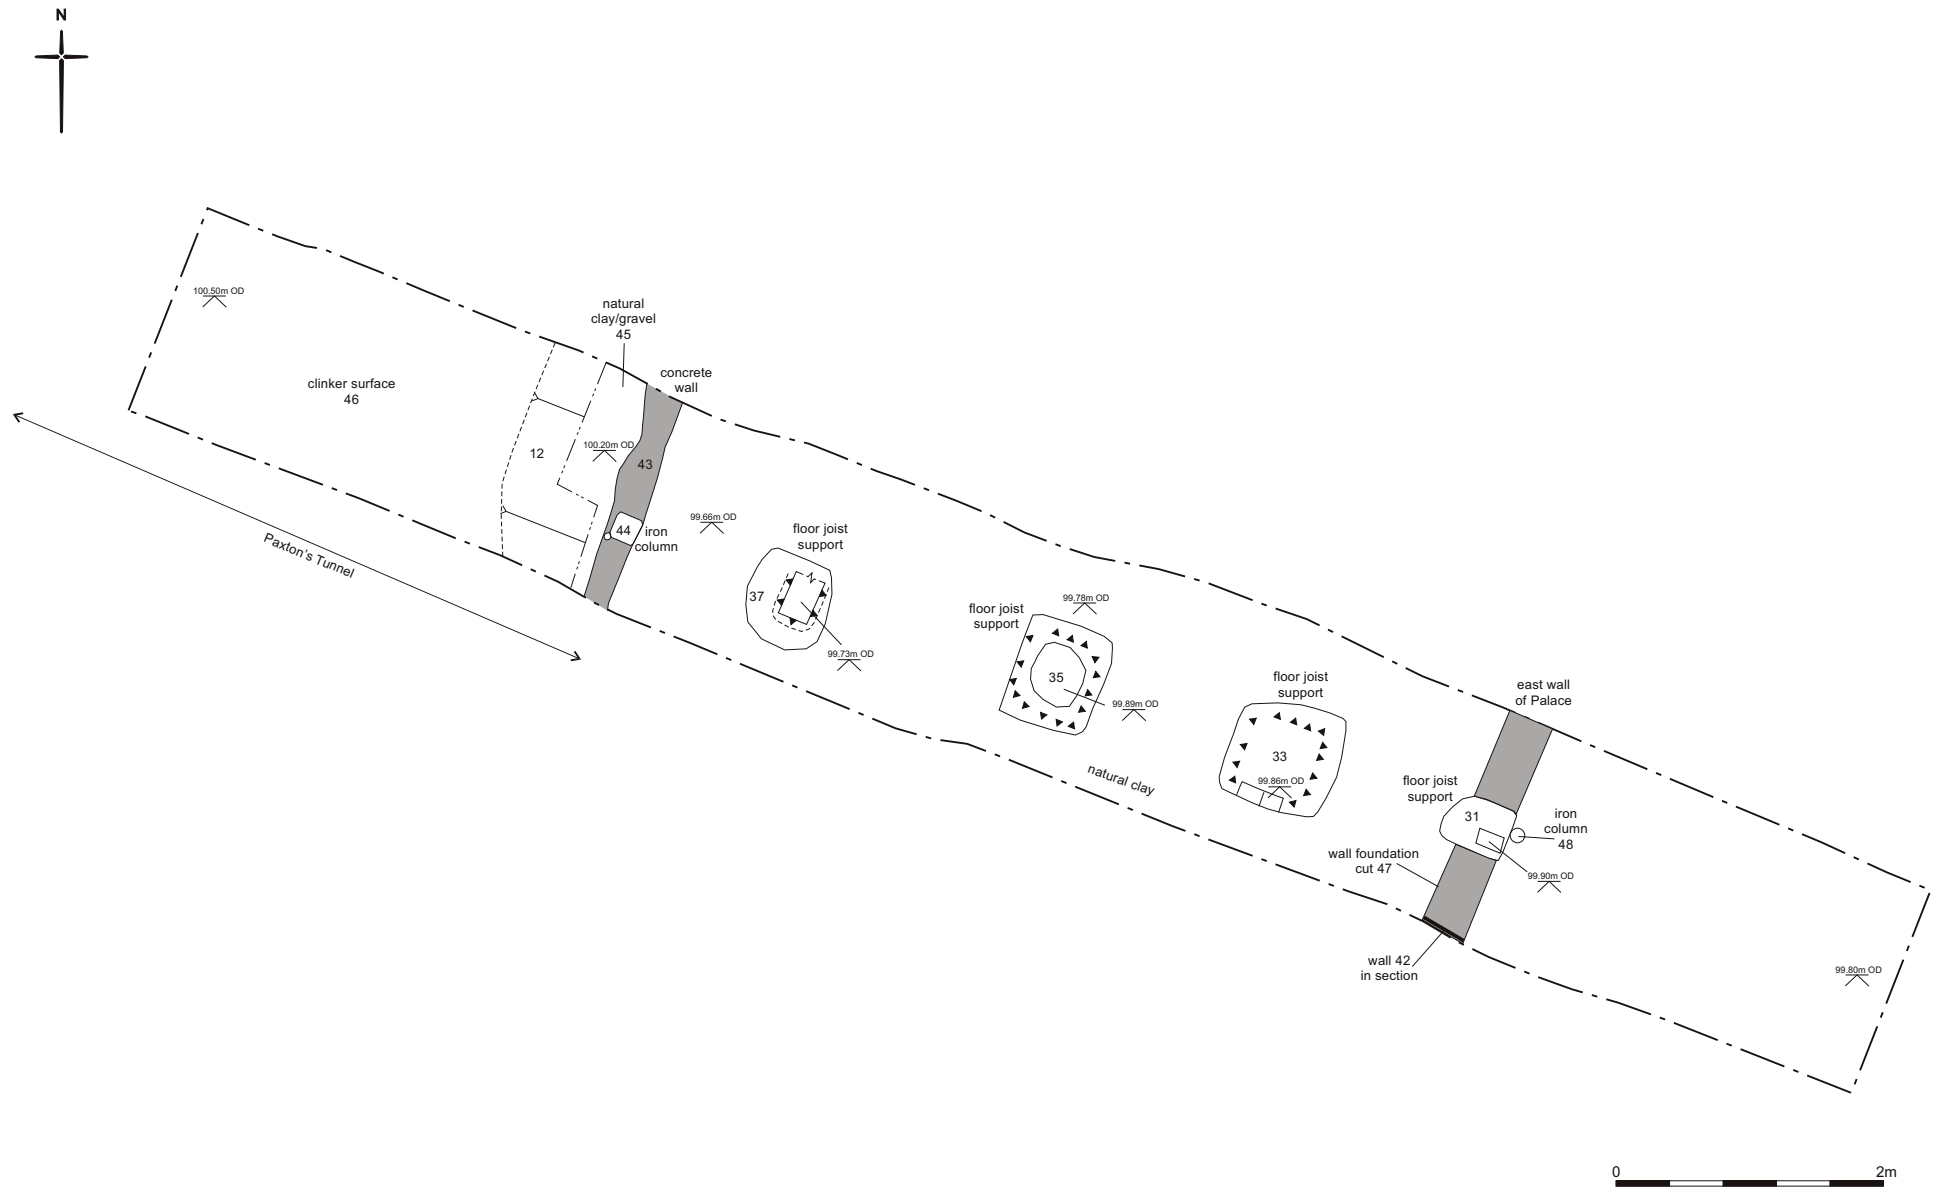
Trench 1B, plan of features from east side of the Palace and Paxton's Tunnel
